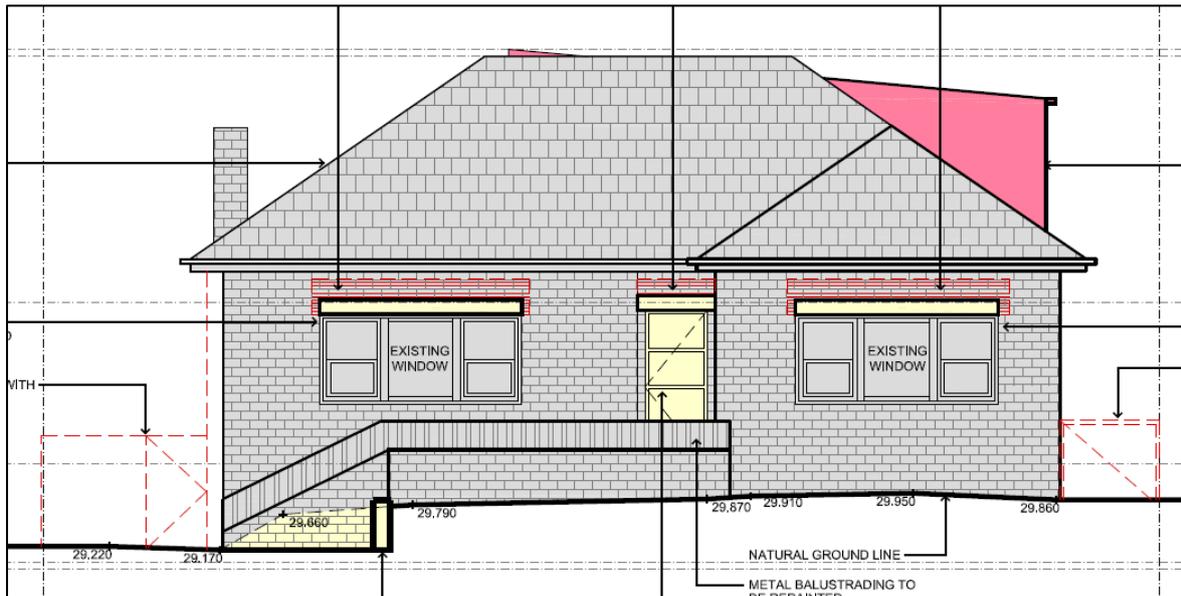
Proposed Western (Street) Elevation (modification in pink)
